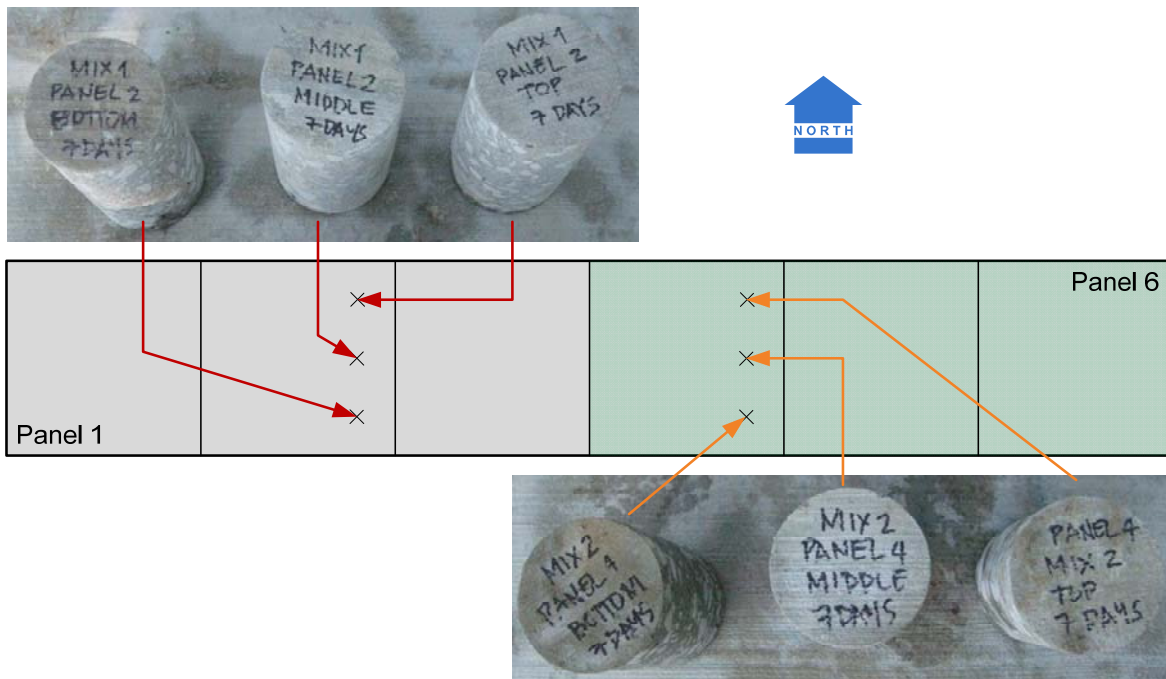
Locations of core samples on the pavement, South 4th Street
